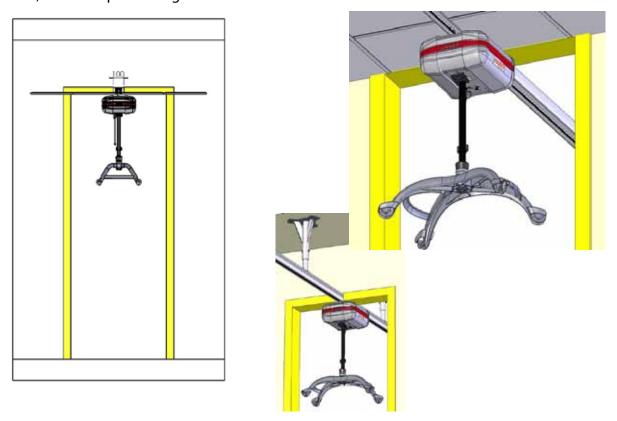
Doorway with continuos rail, ceiling and Molift Hi-Trac
